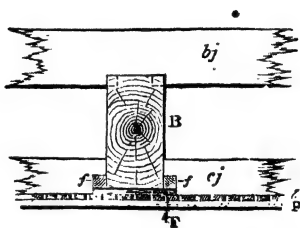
Ceiling Joists supported by Fillets fixed to Binder.
